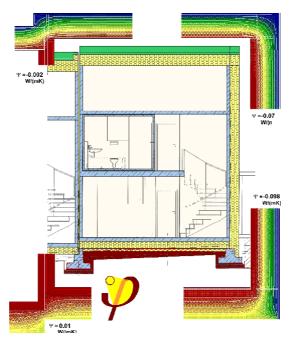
Thermal bridge section in a passive house (PHI, 2006b)
